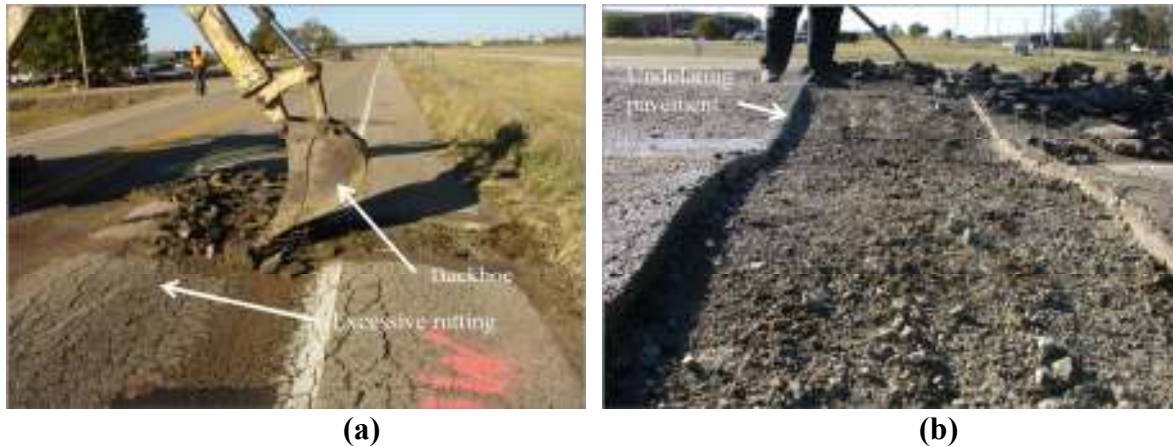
Section 13BW a) trench excavation performed by AHTD personnel using a backhoe, b) after asphalt removal (undulating pavement surface).
